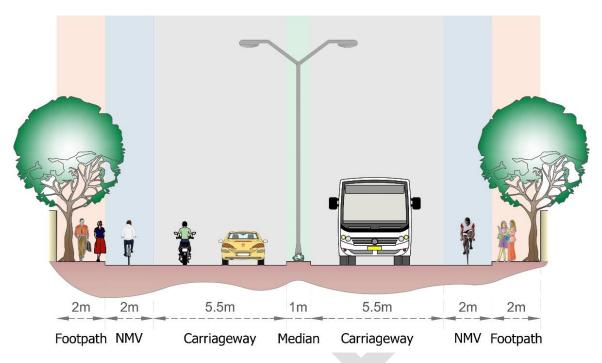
Typical Cross Section of 20m Wide Road with Bicycle Tracks
